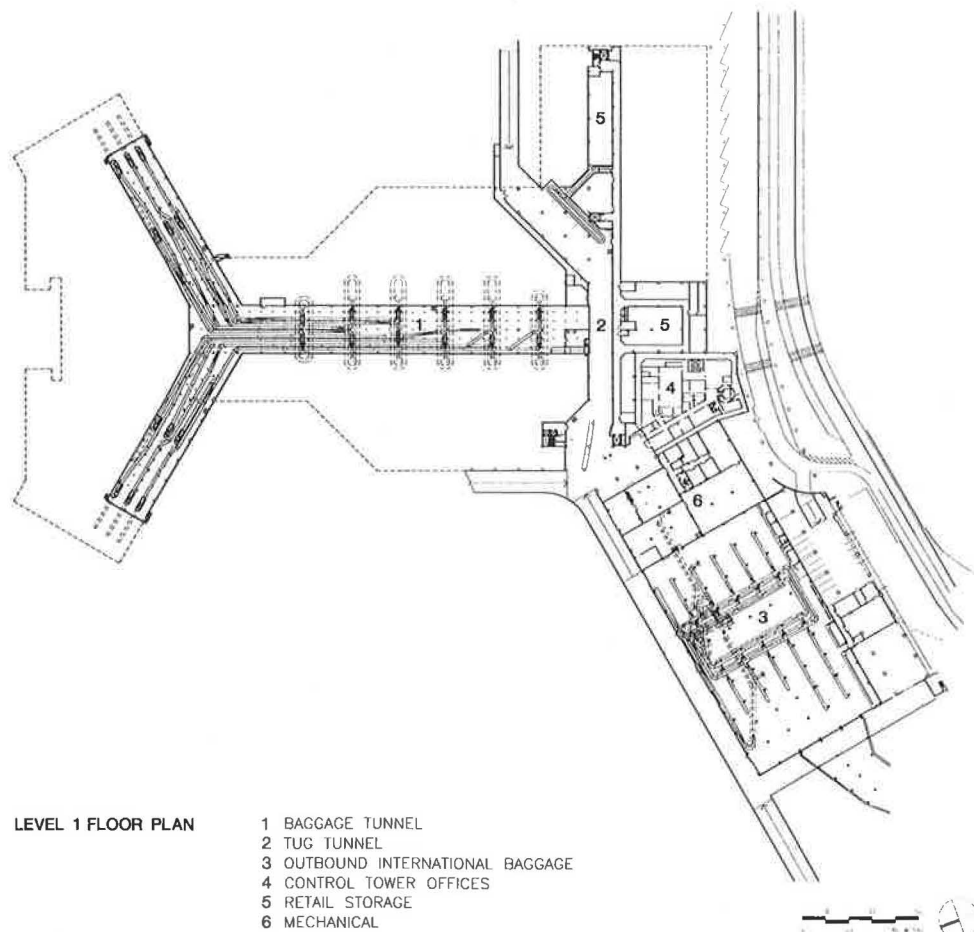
Vancouver International Terminal, level 1 floor plan.
